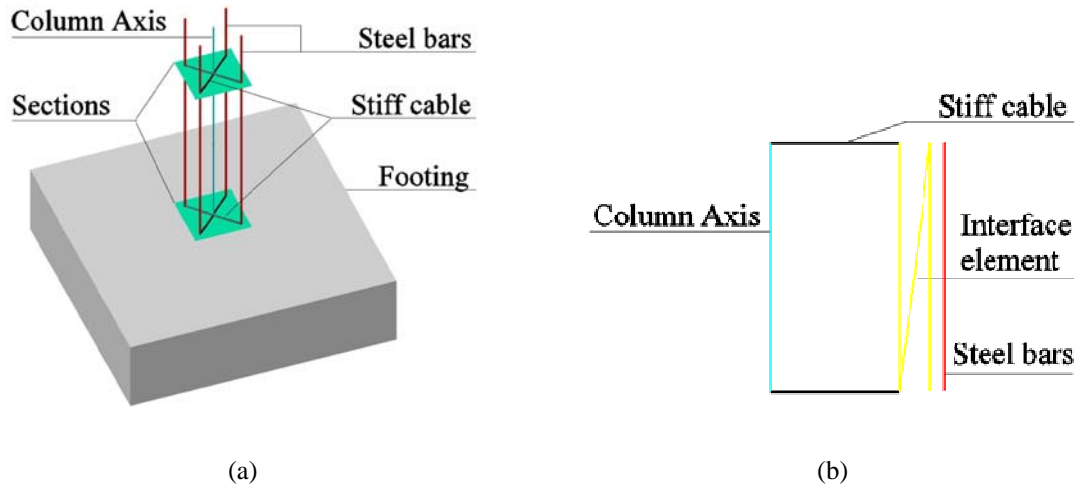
(a) FE modelling of column and (b) View of column axis (Timoshenko beam) in context of stiff cable, interface element and longitudinal steel bars.
